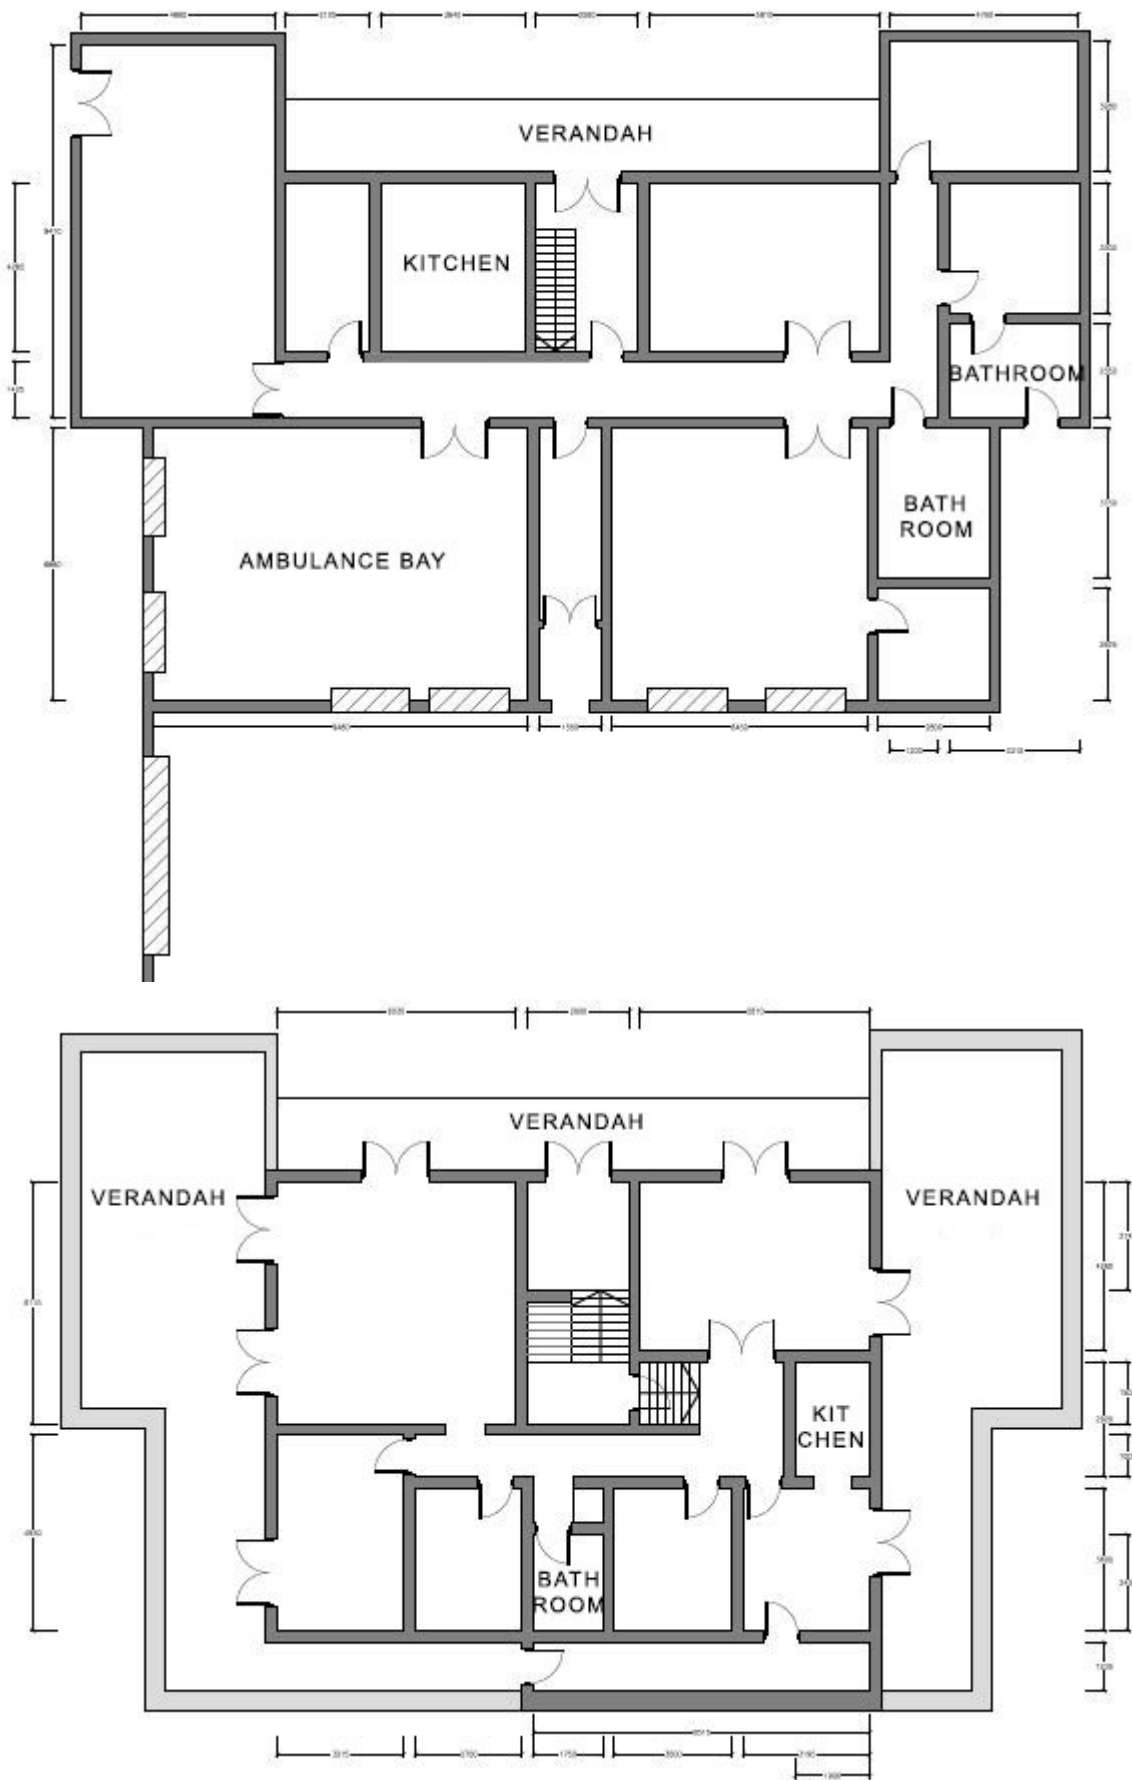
Current floor plans of the internal configuration using original walls. Top – Ground floor. Bottom – First floor. Source: Bathurst Regional Council.
